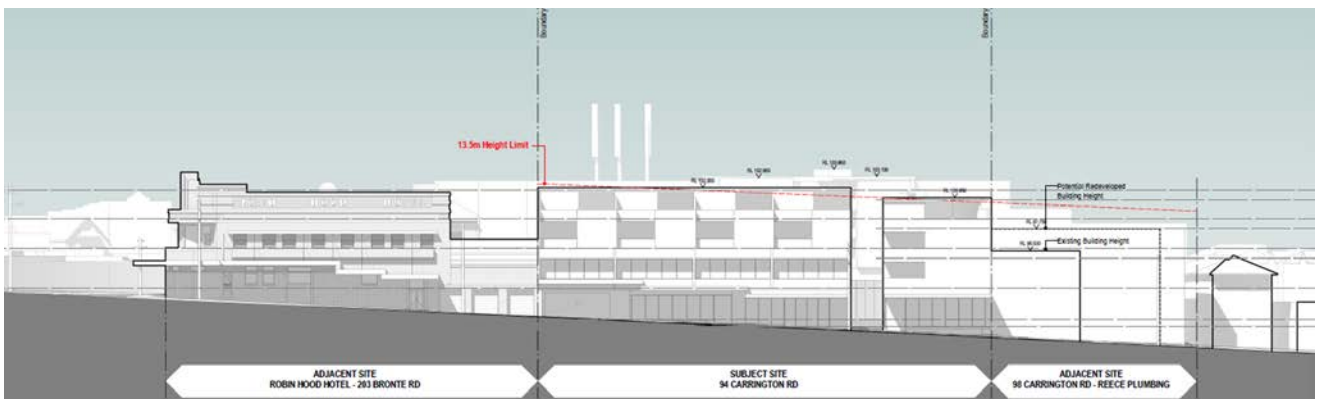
Concept design – elevation, Carrington Road (west) (source: H&E Architects)
